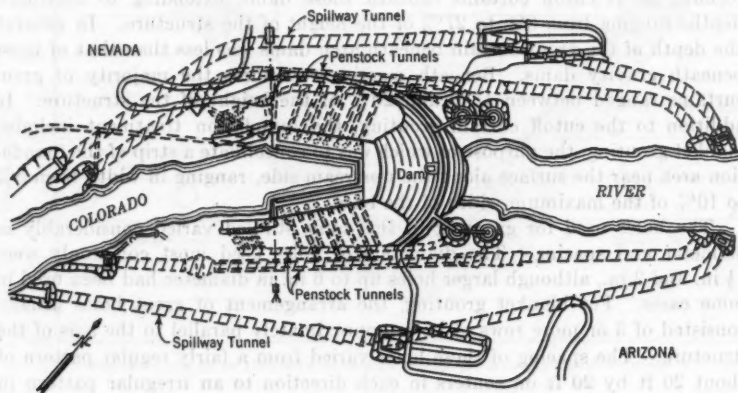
PLAN OF HOOVER DAM AND APPURTENANT WORKS
